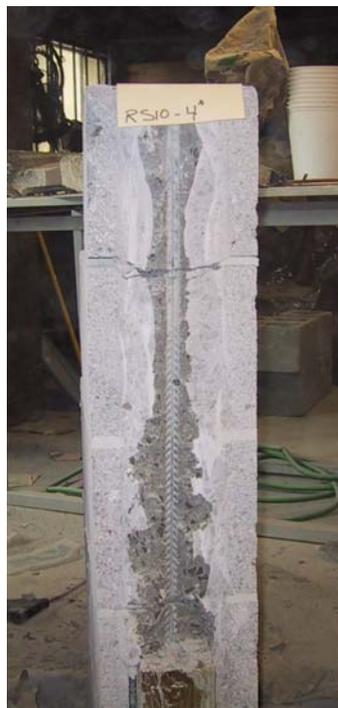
Wall cross-section with pencil vibrator consolidation
